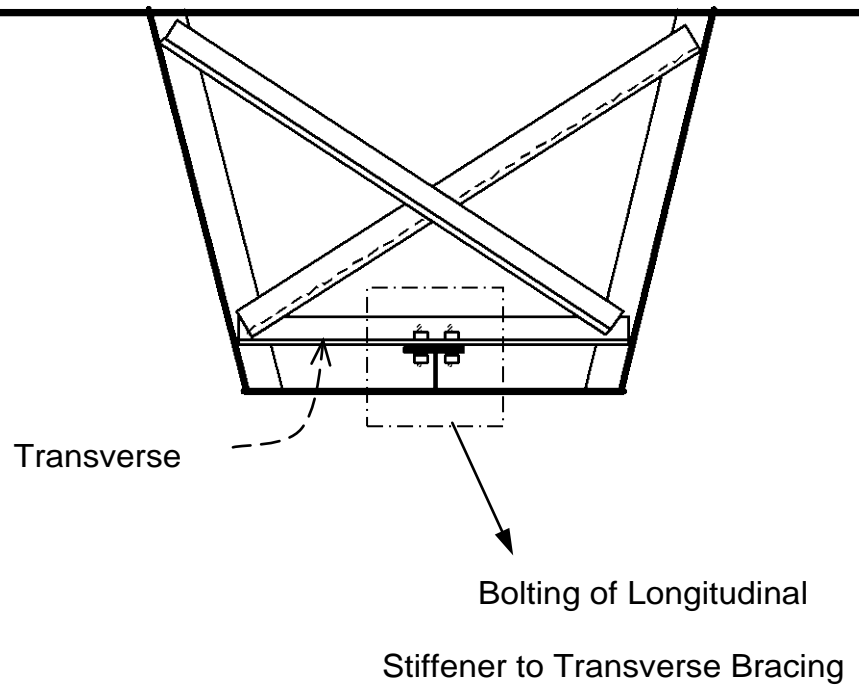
Typical Connection of Transverse Bracing of Cross-Frames and Longitudinal Stiffener in Box Girder
